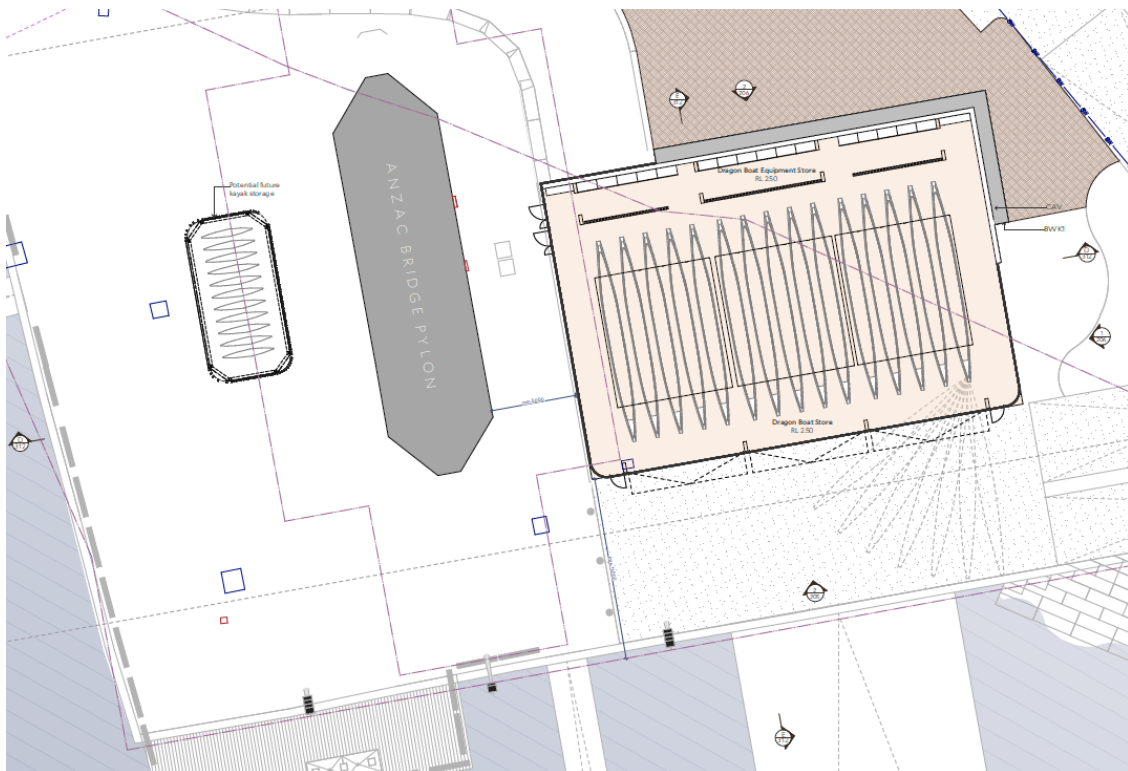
Detail of the planned dragon boat storage facility near the eastern pylon of Anzac Bridge. (Source: Collins and Turner 2023)
